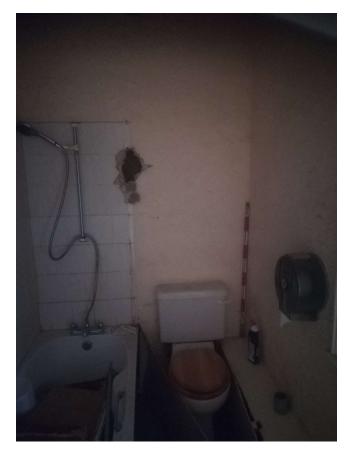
Upper storey bathroom, looking north-west. Scale 1m.
